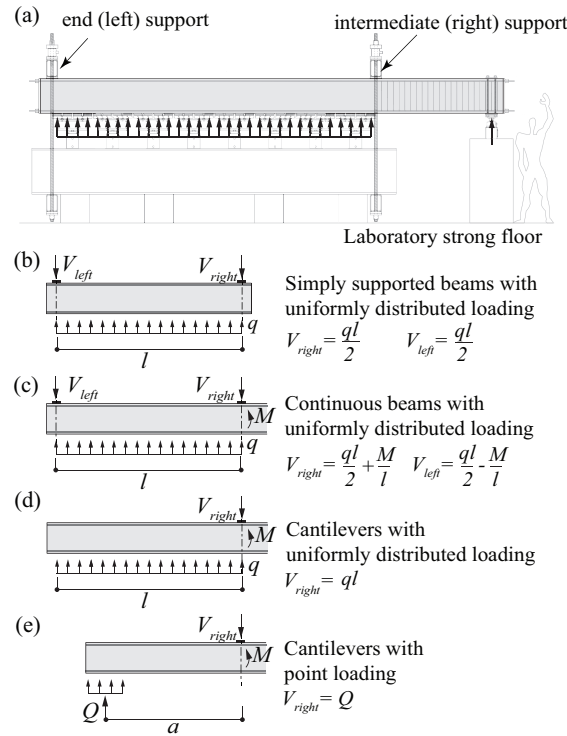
Experimental programme: (a) scheme of the test setup and loading conditions: (b) simply supported beams, (c) continuous beams and (d) cantilevers subjected to uniformly distributed loading, (e) cantilevers subjected to point loading (for more detailed description of the test setup, see Cavagnis et al. [13])
